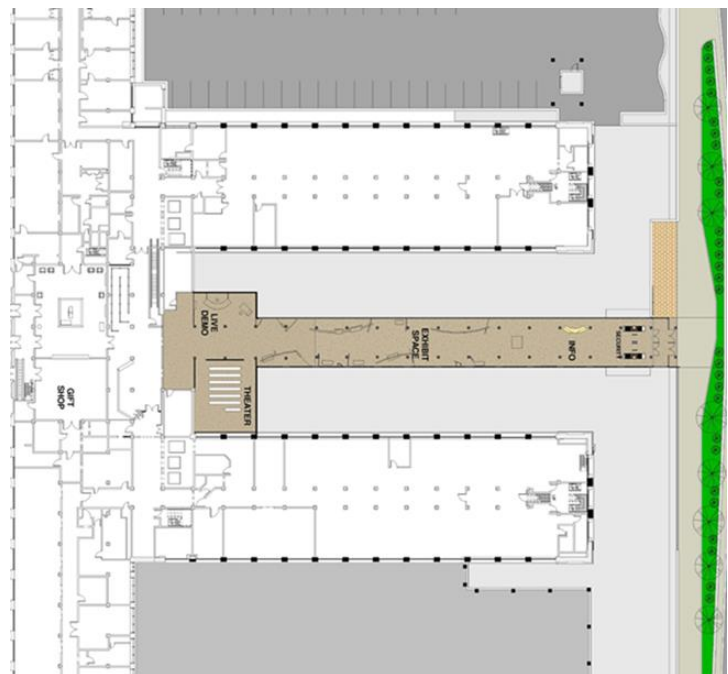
Proposed site plan of entrance bridge and exhibit gallery showing plaza and theater additions. (2009 concept design)
